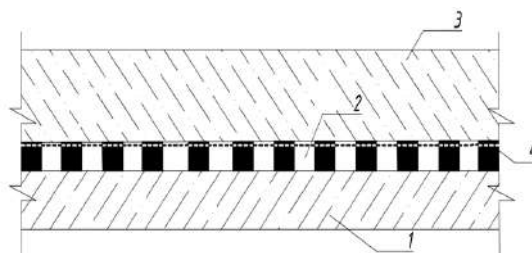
Tray plate with external waterproofing with double-sided adhesion: 1 – reinforced concrete preparation; 2 – sprayable seamless waterproofing made of thermoplastic elastomer 6-8 mm with a front layer of 2 mm reinforced with geotextile cloth; 3 – tray plate.
